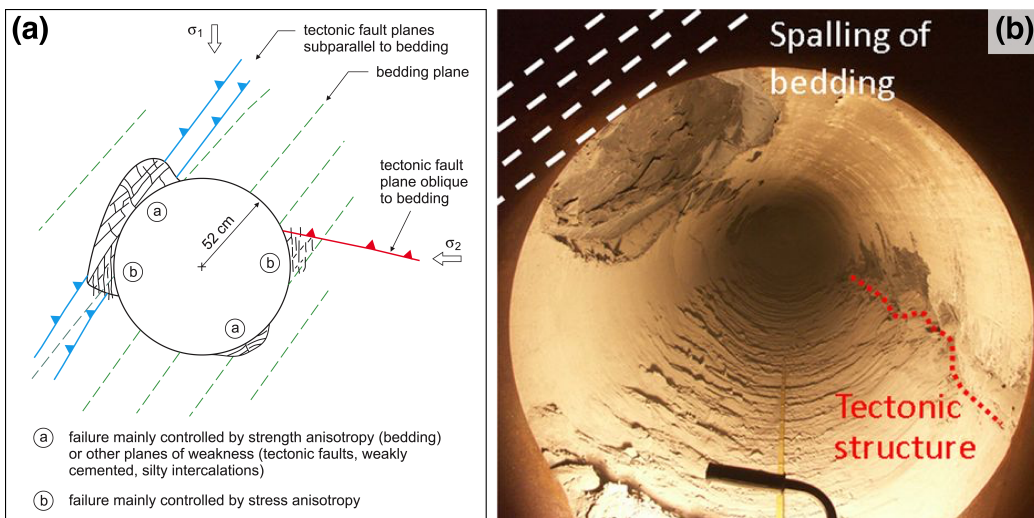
Excavation damage of the HG-A microtunnel: (a) conceptual diagram of the damaged zones and fault traces around the tunnel; and (b) observed damage formation along the tunnel (adapted from Marschall et al. 2006).
